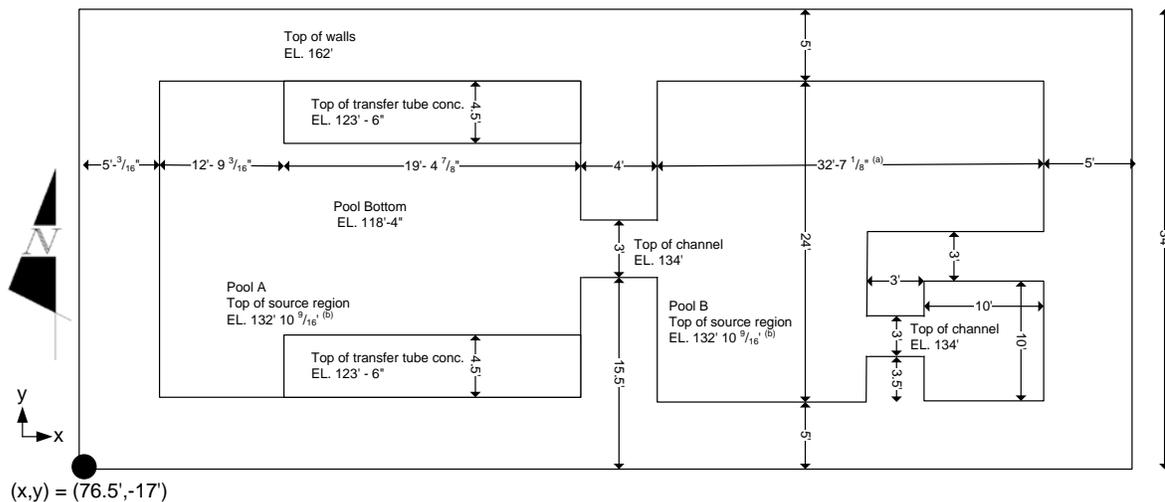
Plan view of the CR-3 SFP Concrete Outline and Sections
